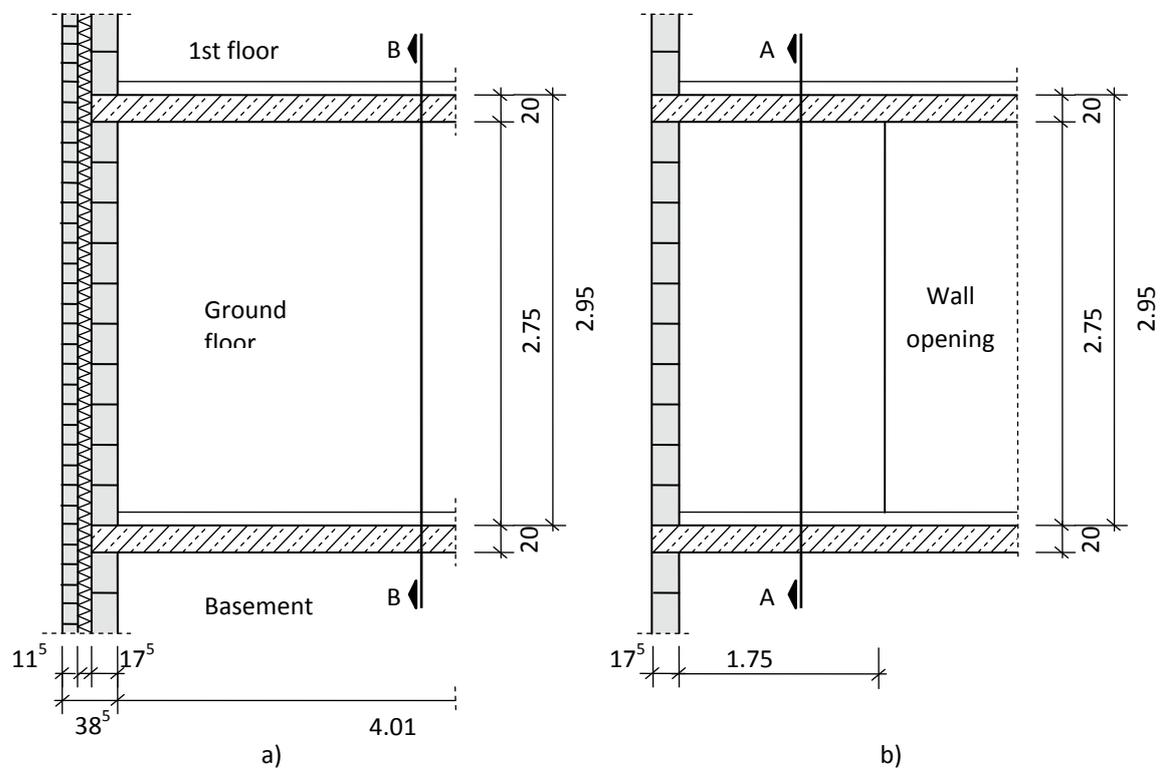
Bracing wall plate, a) vertical section through the bracing wall (section A-A), b) View of the bracing wall from the interior (section B-B)
